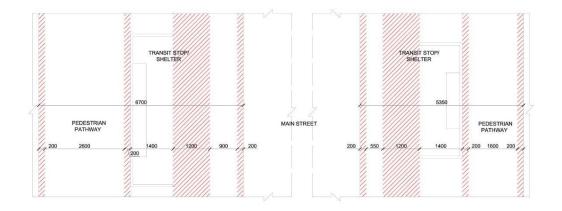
Street width and buffer spaces (in mm) for Gateway 11 in the area surrounding Offenbach am Main Hauptbahnhof
